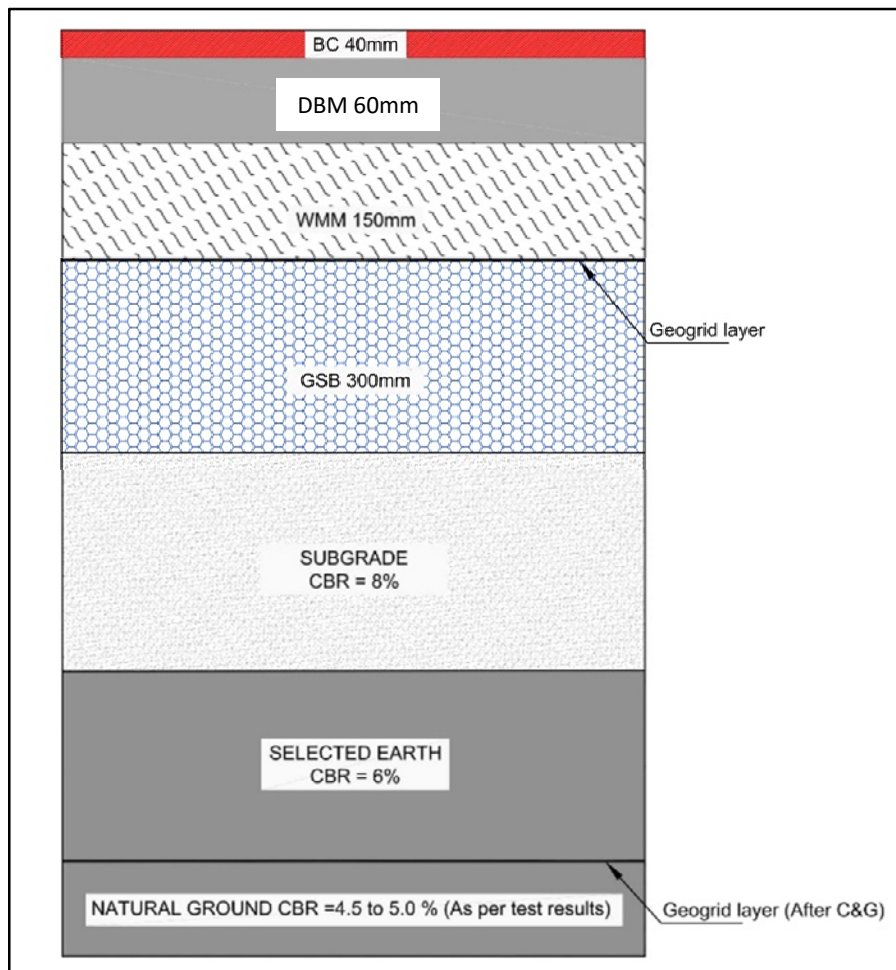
Flexible Pavement cross section with Geo grid provision
